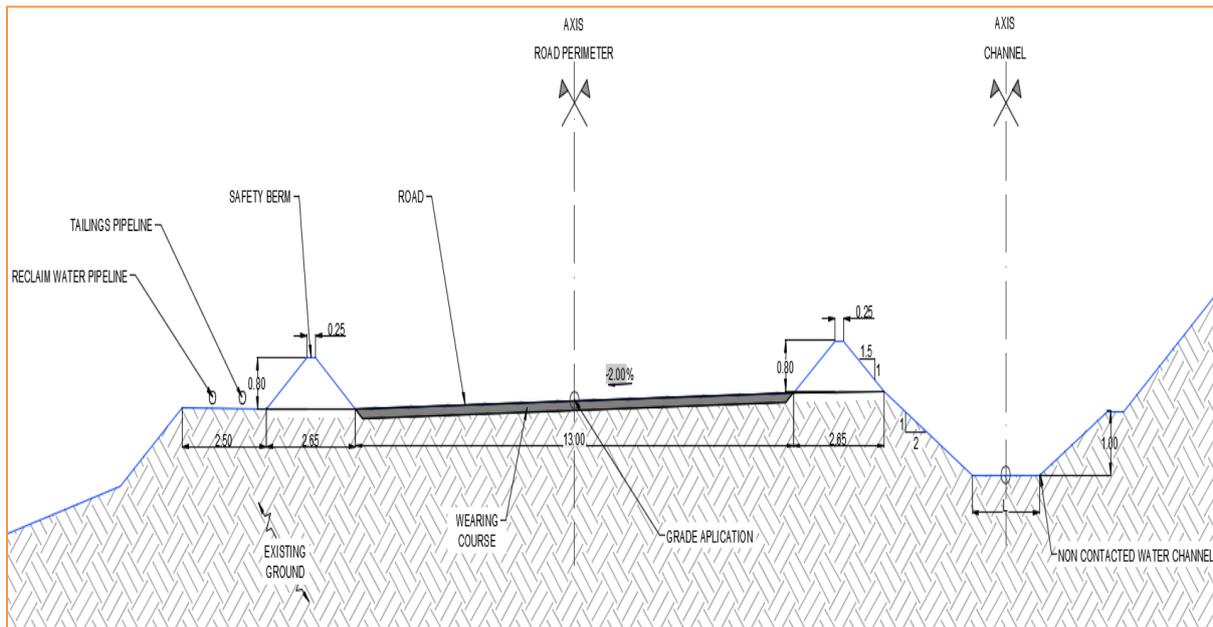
Cross Section - Perimeter Road and Uncontacted Water Channel
